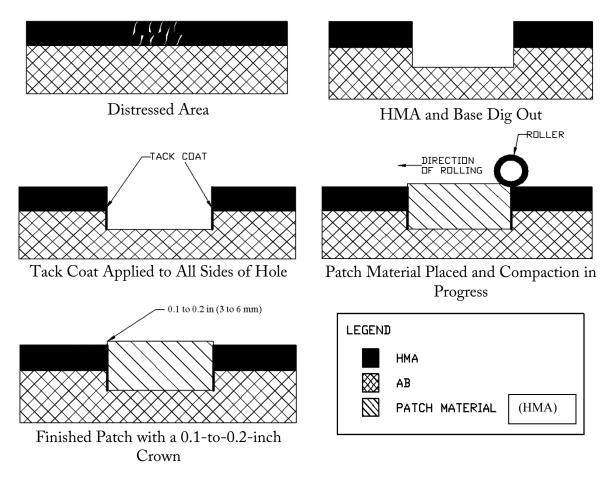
Digout Project Construction Procedure (Caltrans MTAG, 2009)
